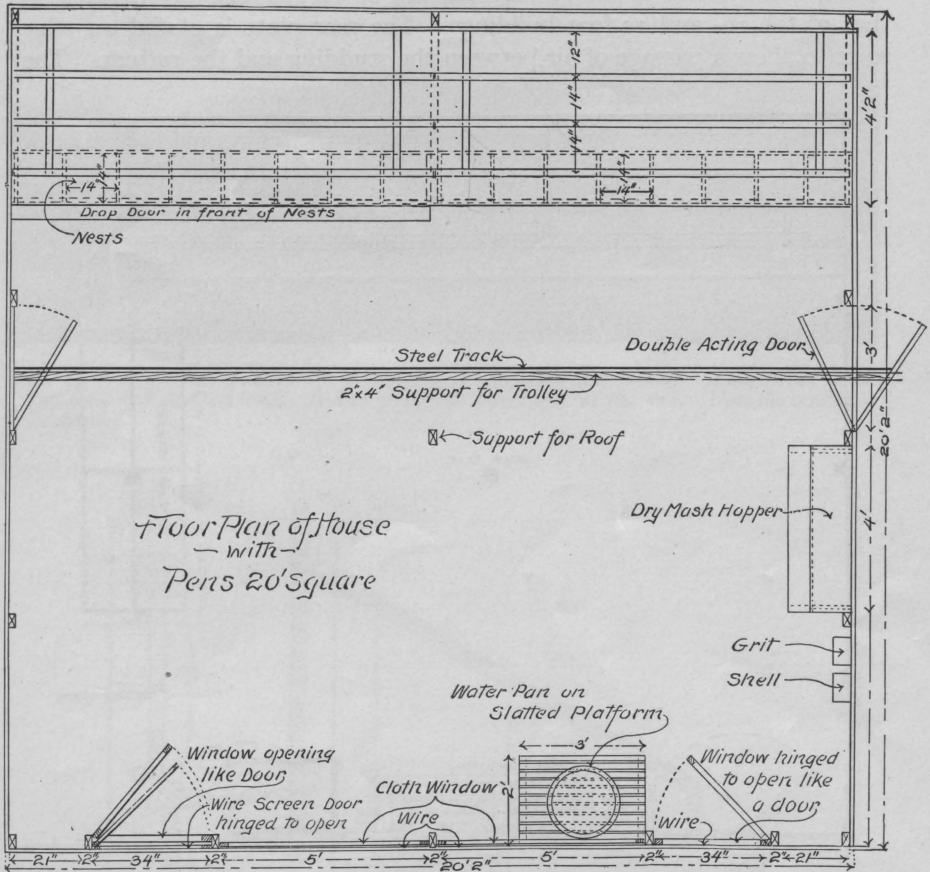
Floor plan of a Cornell poultry house with pens 20 feet square, showing location and dimensions of interior fixtures
